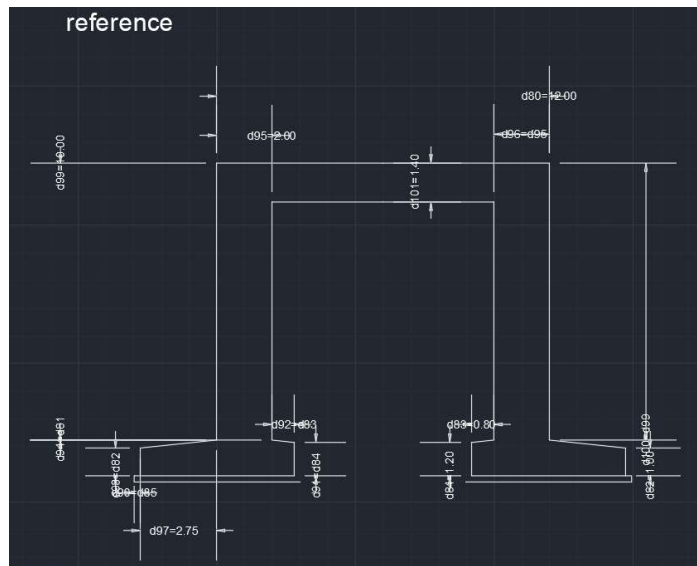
To convert dynamic dimensions into annotated dimensions for showing dimensions on the synthetic technical drawings
